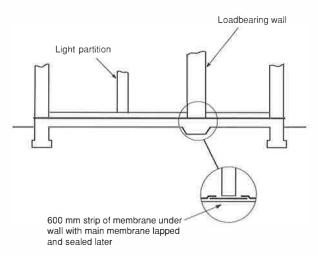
Avoidance of breaking the radon-proof barrier beneath internal walls
